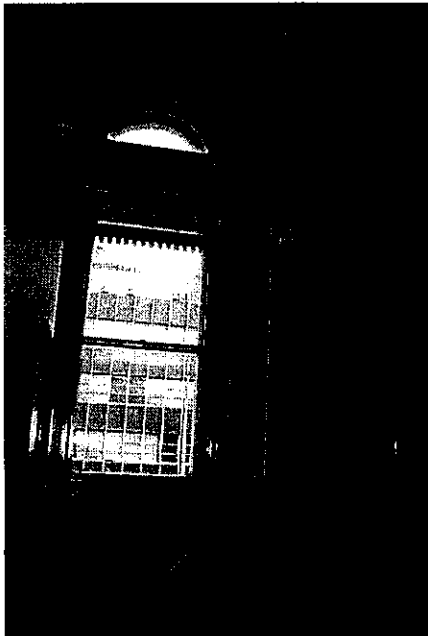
Interior, Office (space FF06). View of west wall showing timber framed double hung windows and semi-circular window.
